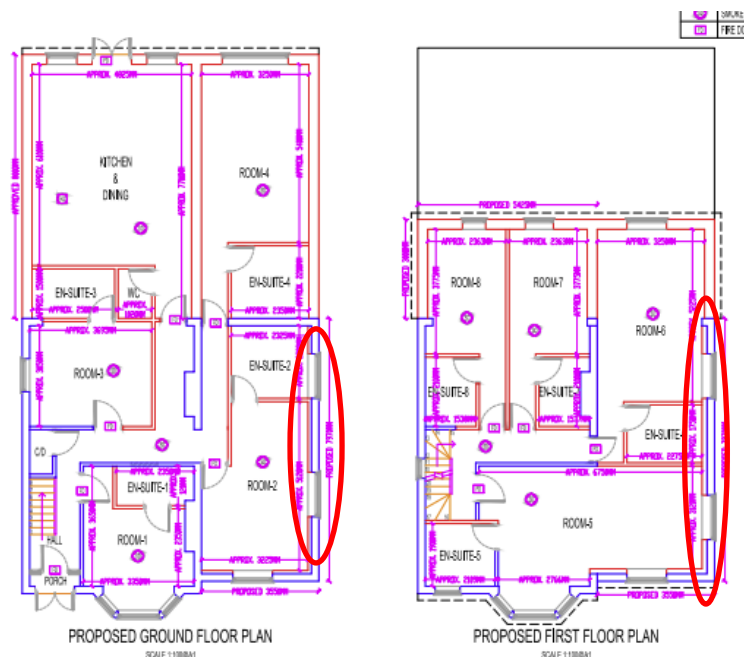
No. 27 Aldin Avenue South Proposed Ground Floor and Proposed First Floor planning ref P/13410/004 dated 20th December 2018
